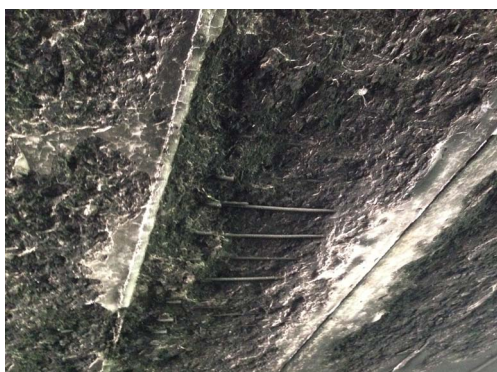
The spalling concrete cover and the exposed reinforcement
